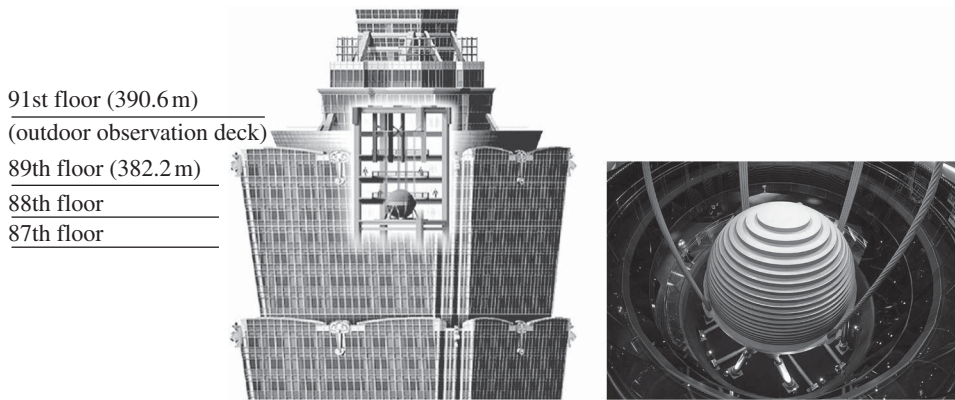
Tuned mass damper installed at the top of Taipei 101 tower, Taiwan
